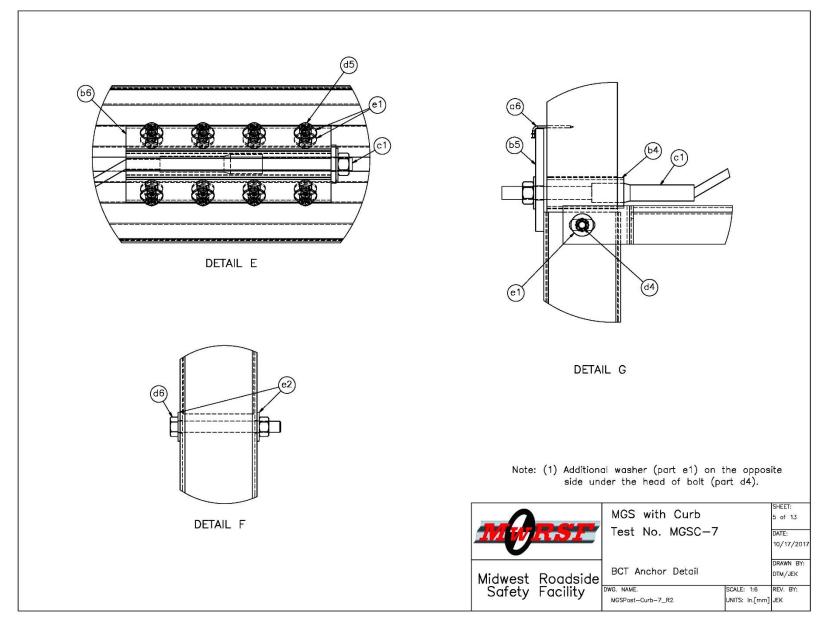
BCT Anchor Detail, Test No. MGSC-7
